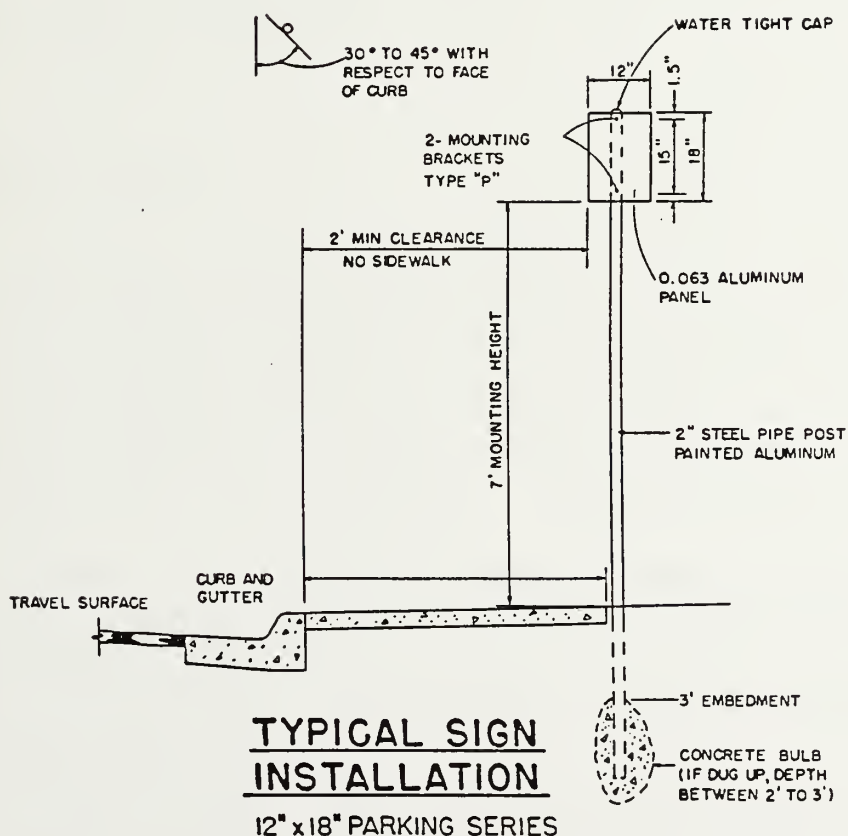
TYPICAL PARKING SIGN DETAILS
